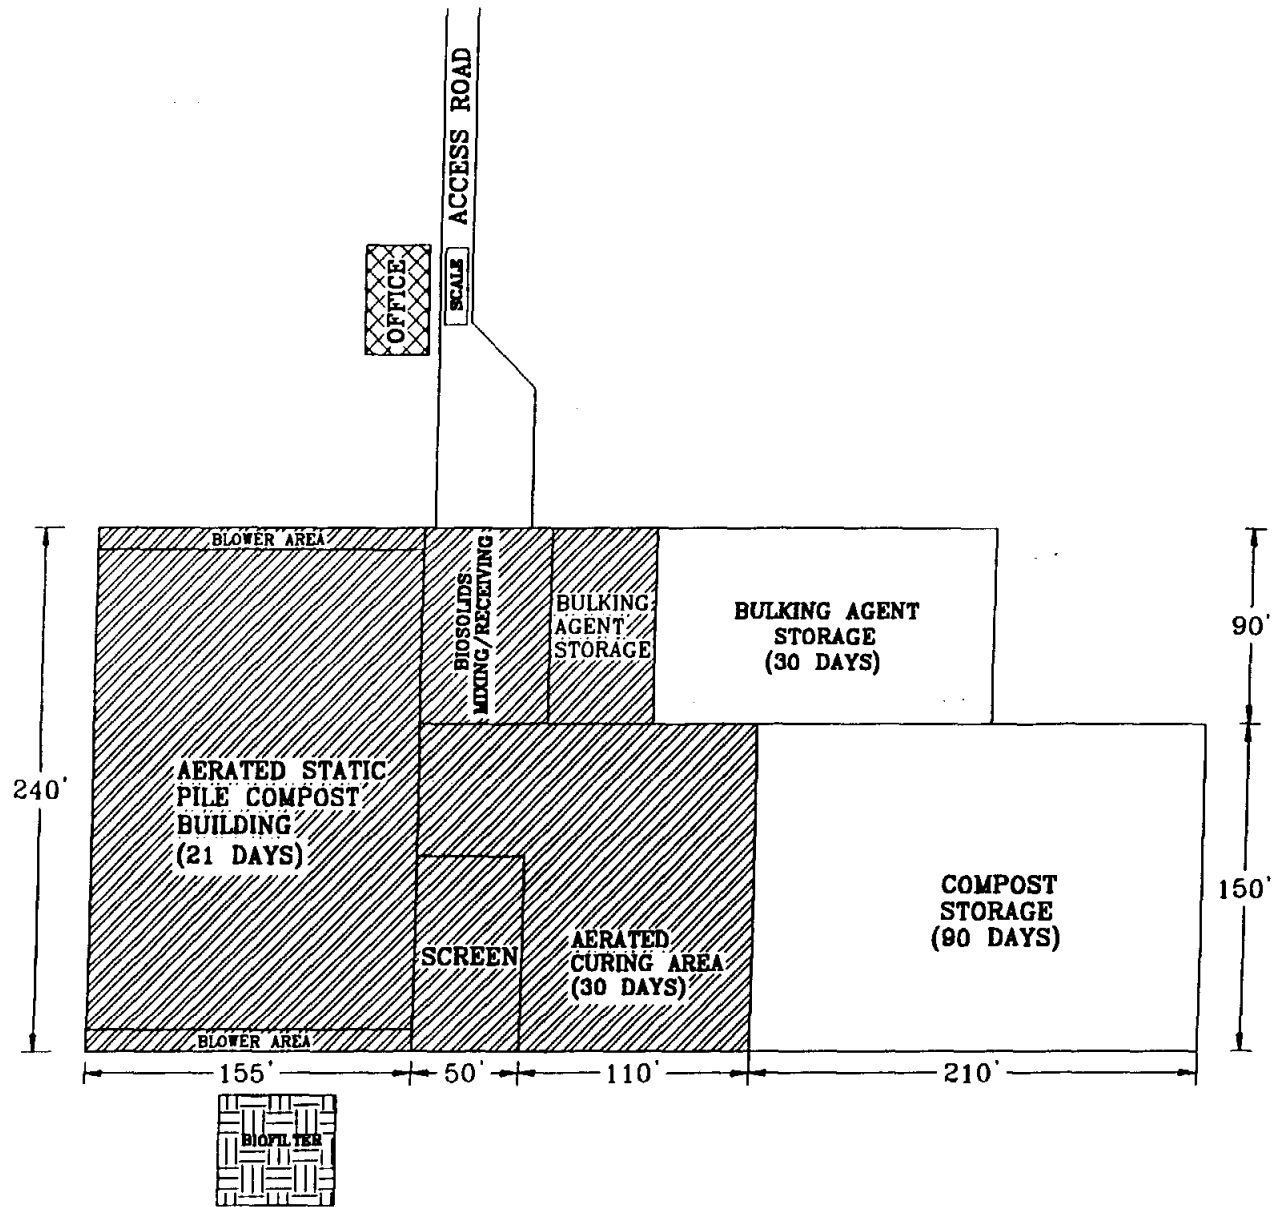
FACILITY LAYOUT - AERATED STATIC PILE 15 DTPD
